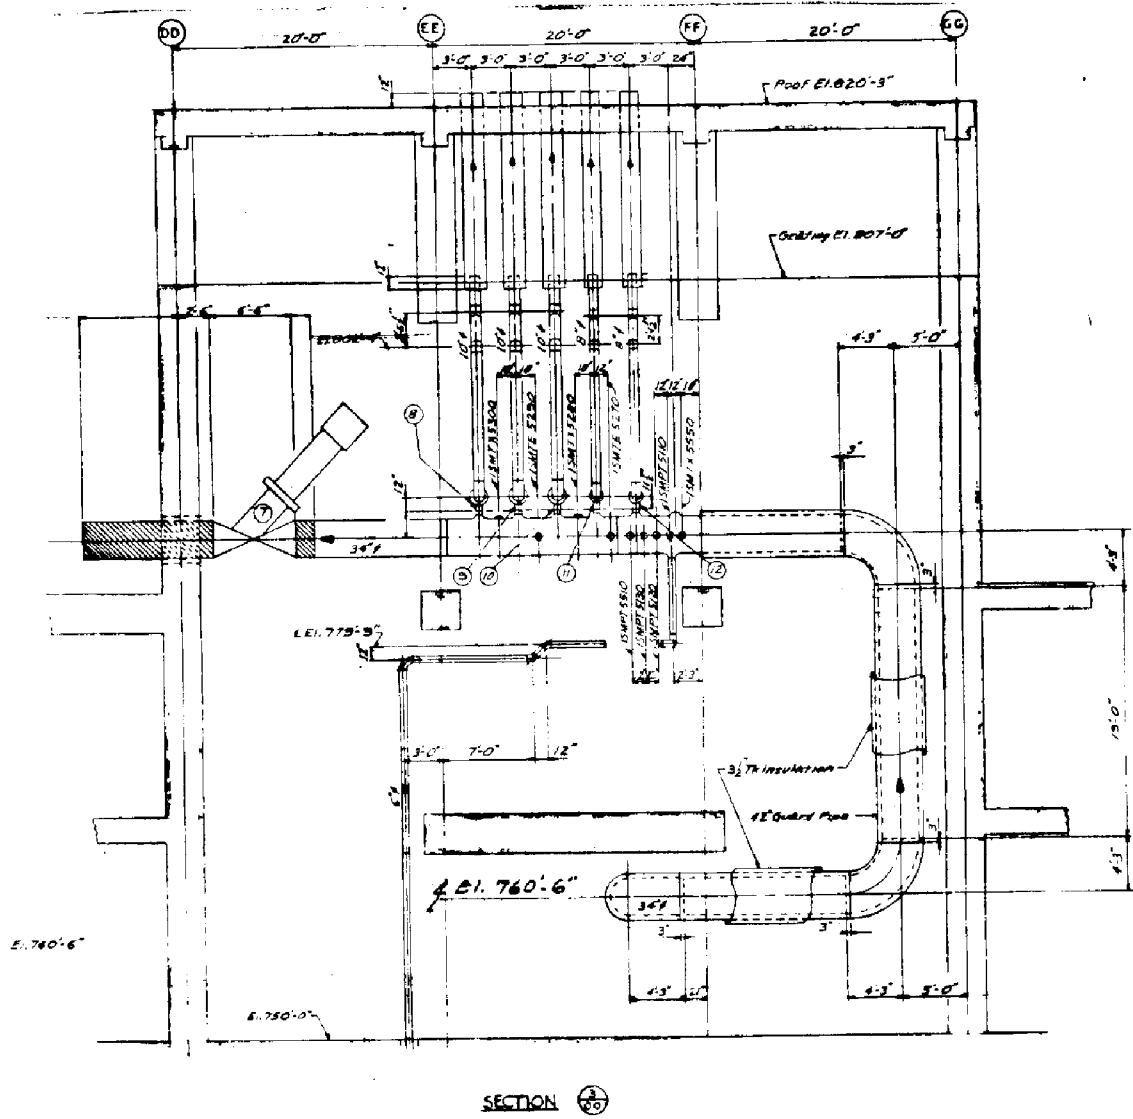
Main Feedwater Routing Plan Outside Containment
